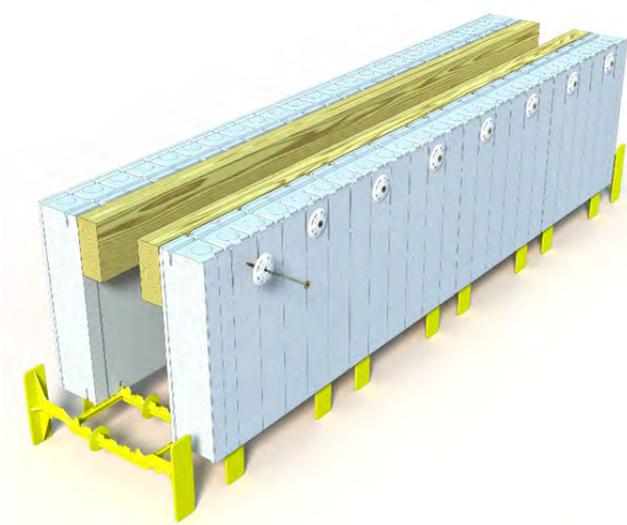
Internal Wood Buck-out with backing strip added to concrete side (lined with Peel & Stick waterproofing membrane)
